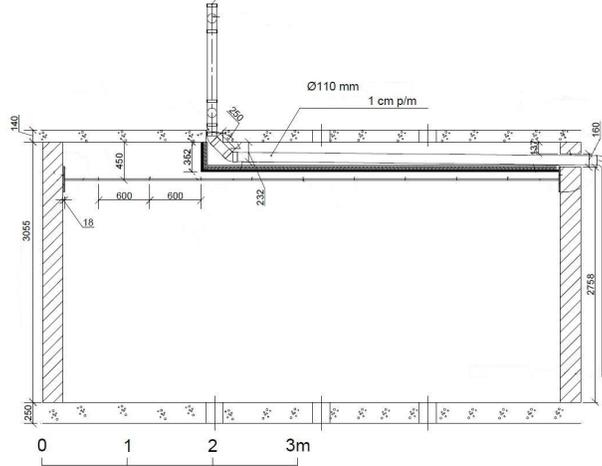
Cross section A-A of the measurement setup with a horizontal drainage
